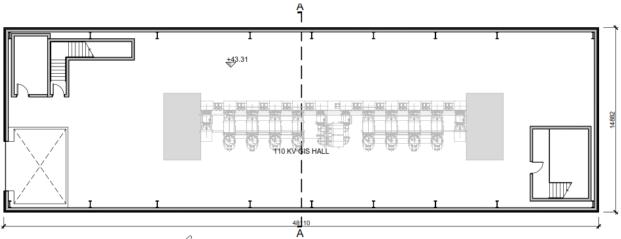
Extract from Reddy Architecture + Urbanism First Floor Plan for the GIS Building
